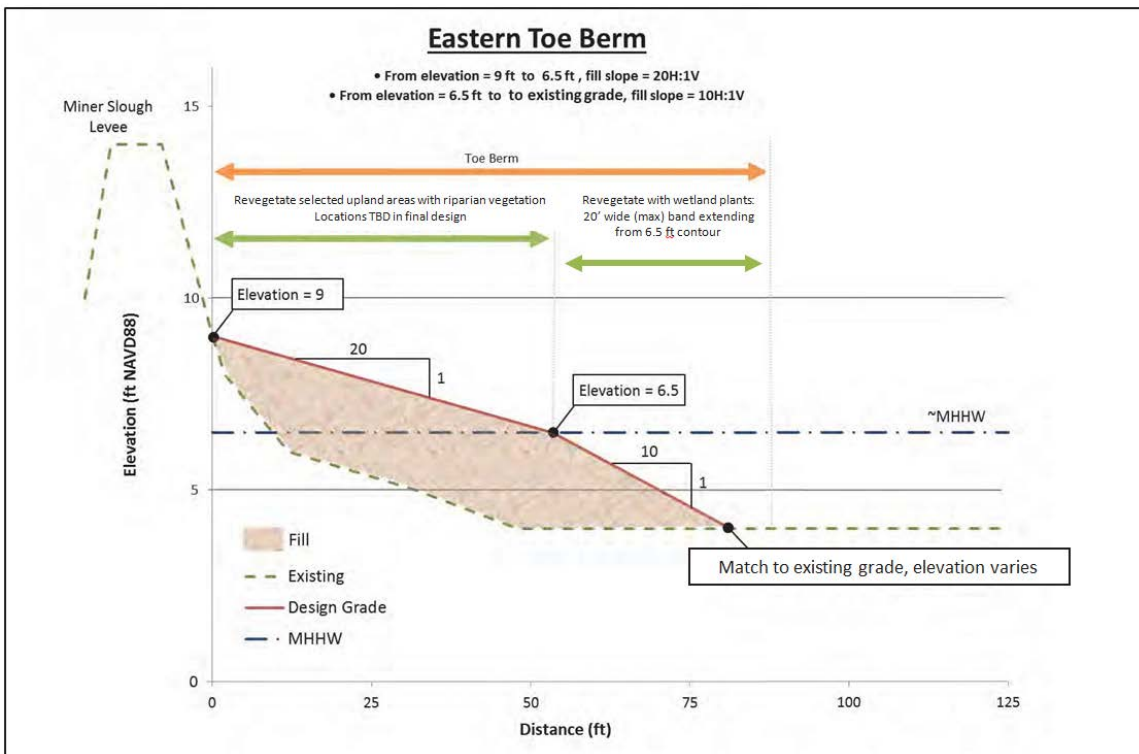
Proposed cross-section design of the eastern toe berm.
